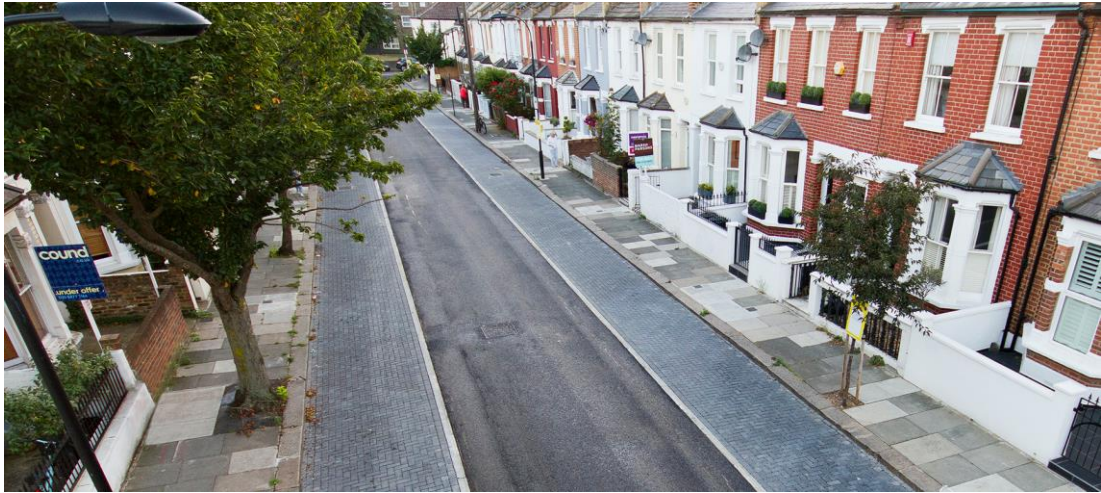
Permeable paving retrofit on Mendora Road, London (2016) (FM Conway 2020).
